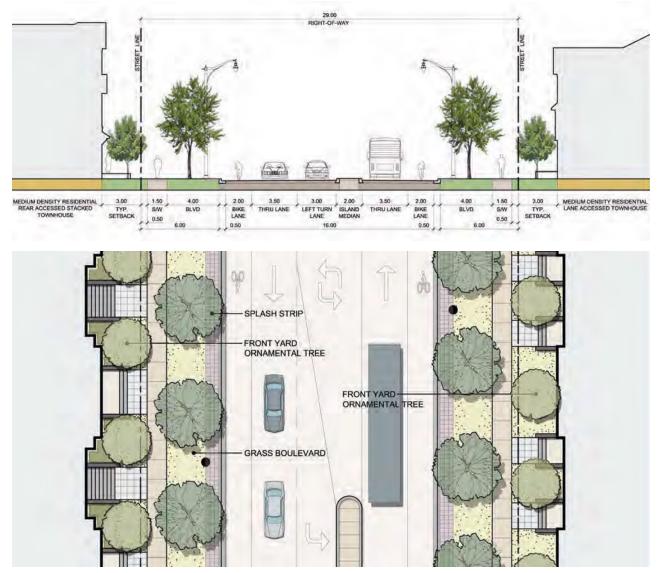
Section A1-A1: Conceptual Spine Road treatment west of Collector Road D intersection (29.0m ROW) with 2 thru lanes, left turn lane, island median, on-street bike lanes, and street trees in grass boulevard adjacent to lane-accessed townhouses (looking west).
